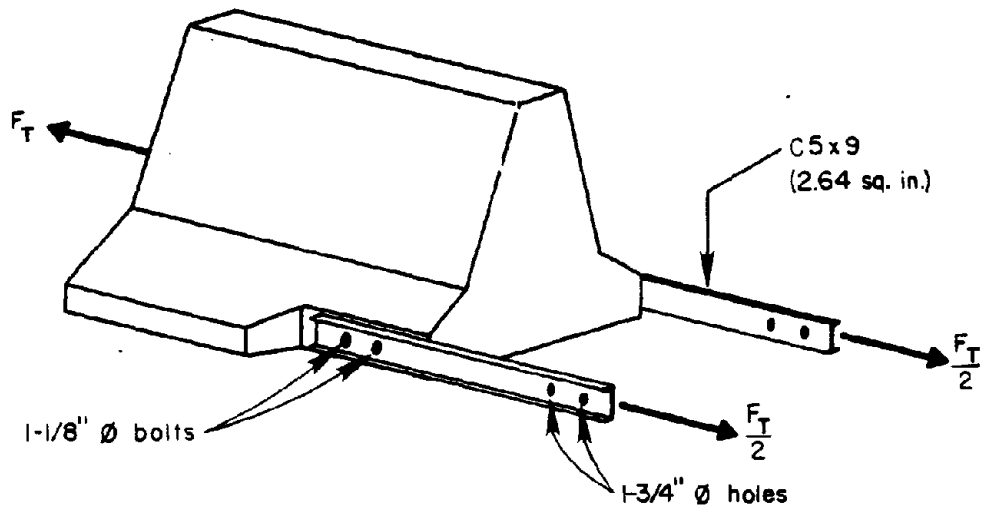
Forces on Bolts and Channels When Connection is in Tension.
